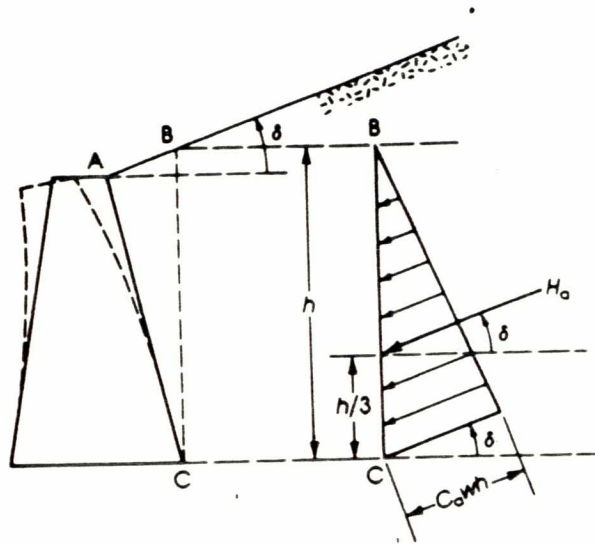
Active Pressure Distribution Behind A Retaining Wall.
